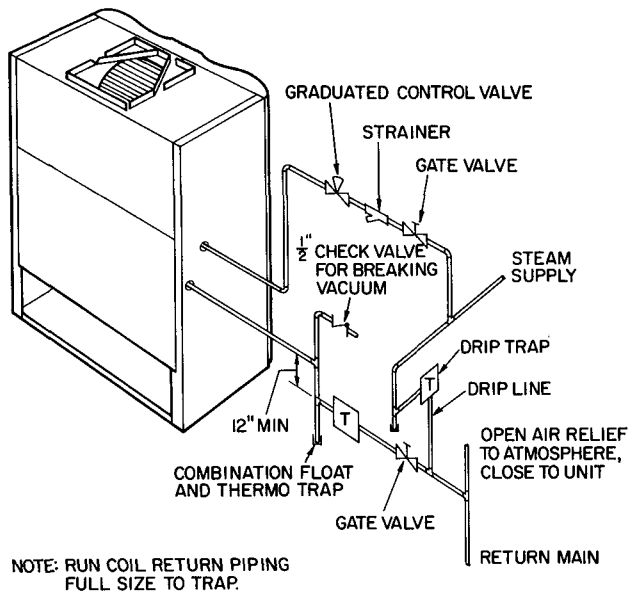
Typical Steam Distributing Coil Piping for Open Gravity Systems with Steam Pressure Below 10 Psig
